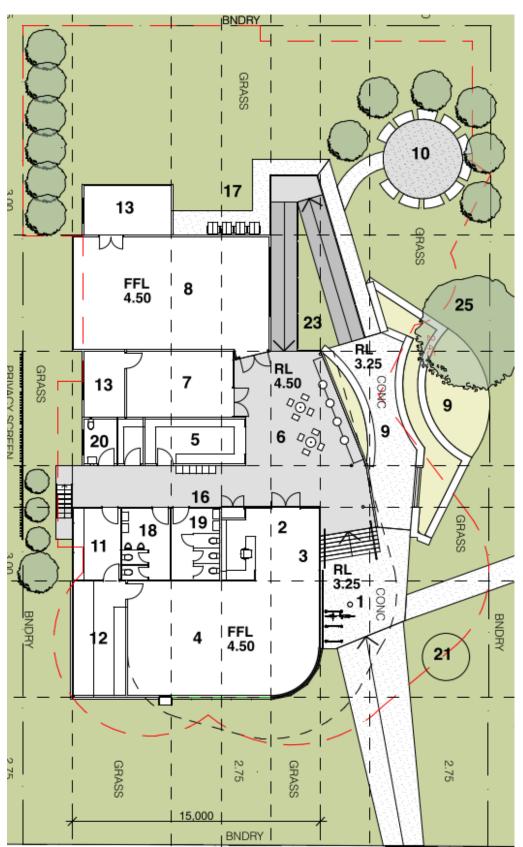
Modified floor plan showing a single level at RL4.5m Australian Heigh Datum (AHD). The original building outline is shown with red dashes. The flag pole is outside the boundary to the right of 21.
